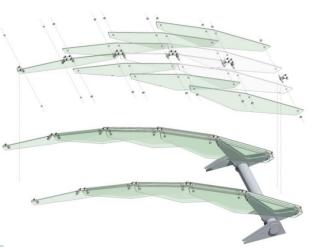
Detail drawing of Yurakucho load bearing structure by R. Hughes [17]
